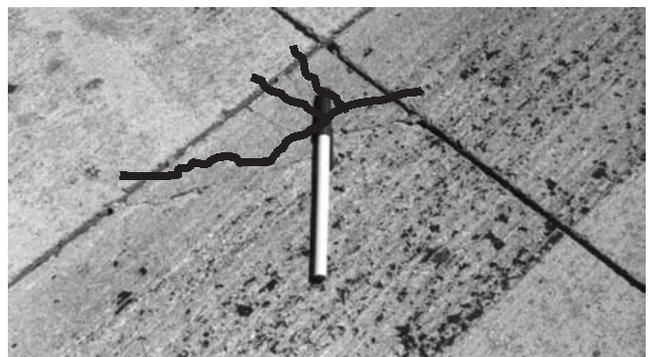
Typical UTW deflection spalling at the FHWA ALF.
